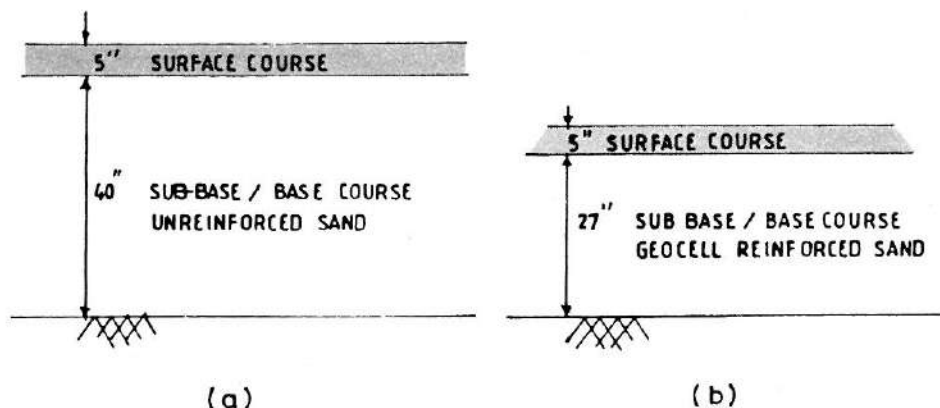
Typical cross section of the pavement (a) Unreinforced (b) Reinforced
